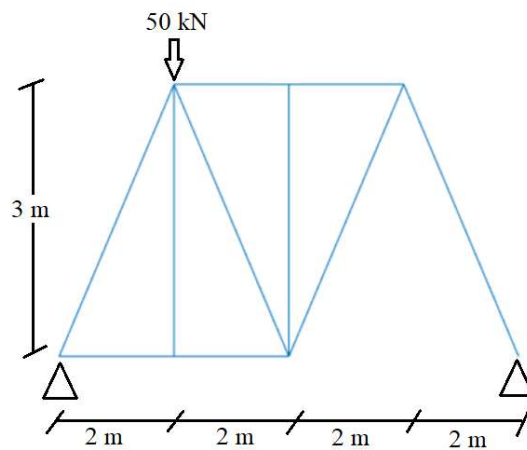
Optimal Truss Structure of Twenty-One Elements Truss Subjected to Second Load Case
